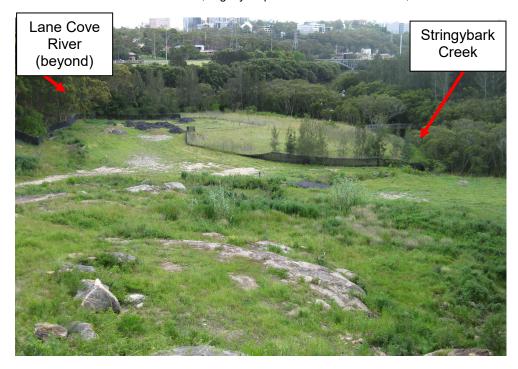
View north towards Stringybark Creek and the Lane Cove River. The site slopes down to the north-east, towards a filled and levelled area.
